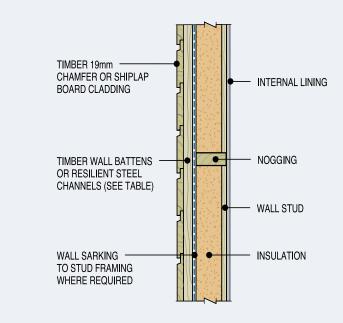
Chamfer Board or Shiplap Board cladding. Vertical section through wall
